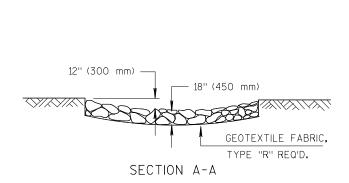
DETAIL FOR SPECIAL DITCH WITH MEDIUM RANDOM RIPRAP AND GEOTEXTILE FABRIC
